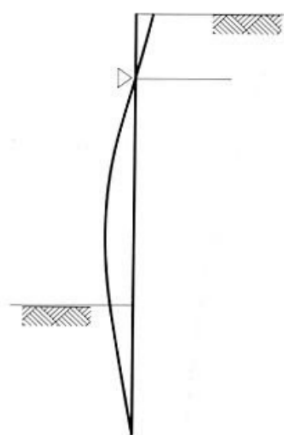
Typical Deflection Shape of Anchored Sheet Pile Wall [18]
